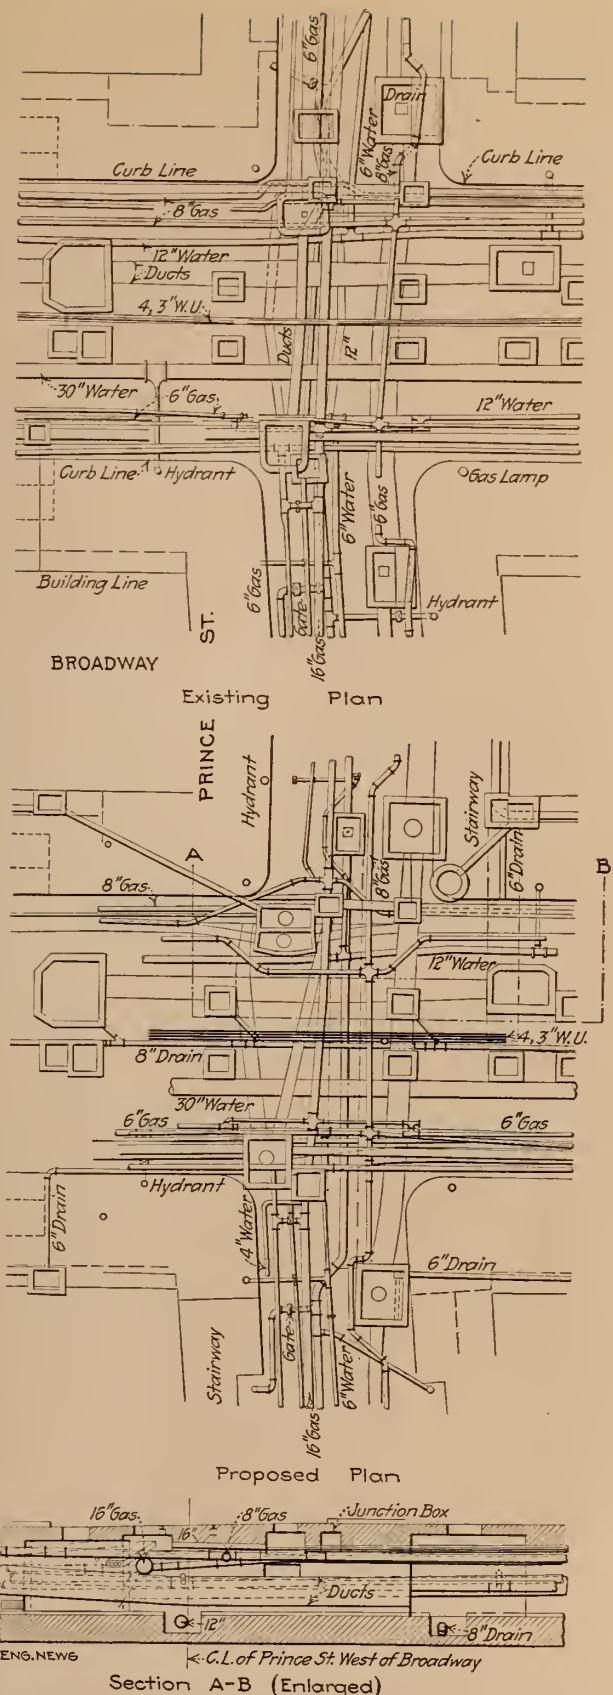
A TYPICAL REARRANGEMENT OF UNDERGROUND PIPING AT A STREET INTERSECTION, OLD AND NEW PLANS OF UNDERGROUND PIPING AT BROADWAY AND PRINCE ST.
